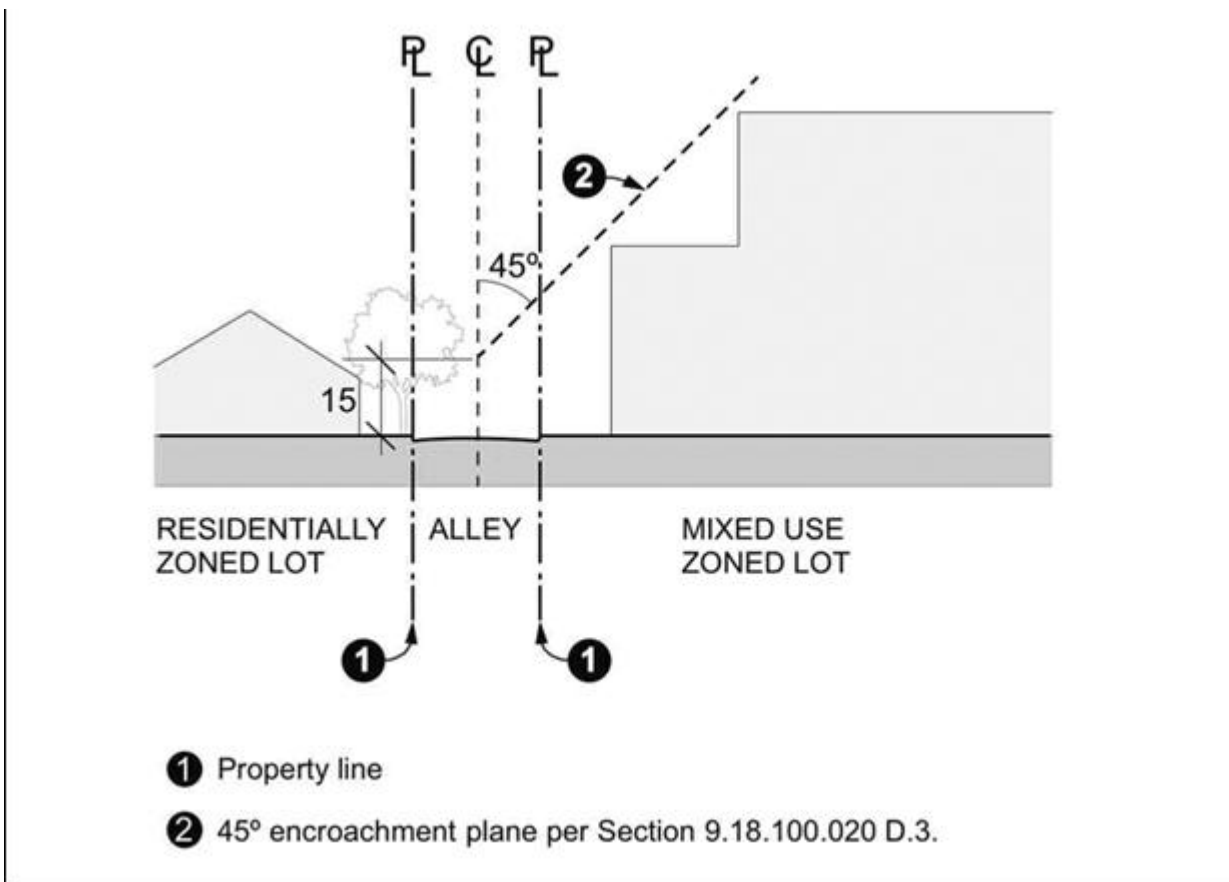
Rear Yard Setback and Encroachment Plane at Alley Abutting Residentially Zoned Lot
